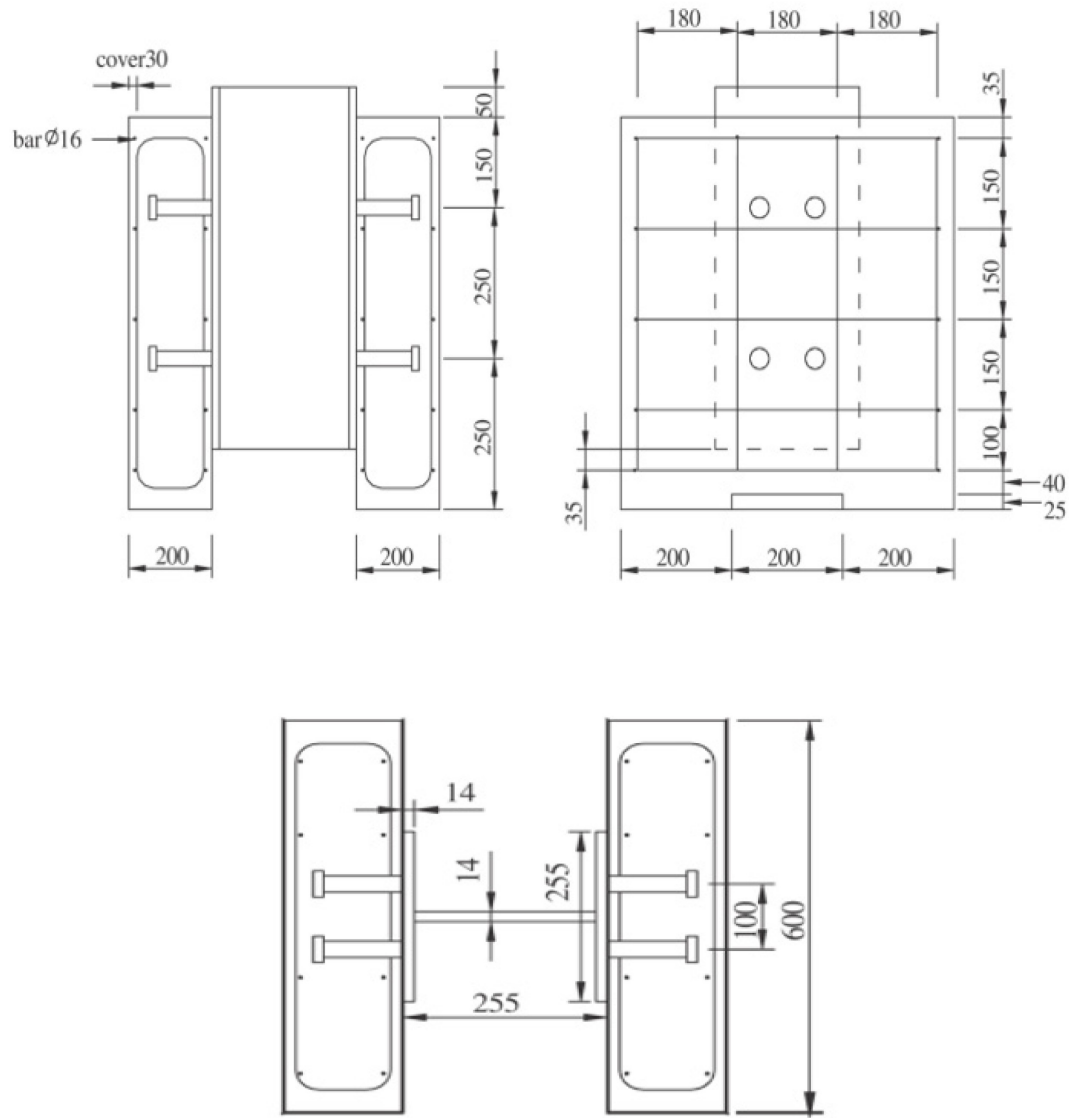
Geometry of push-out specimen (Lee *et. al.* 2005)
